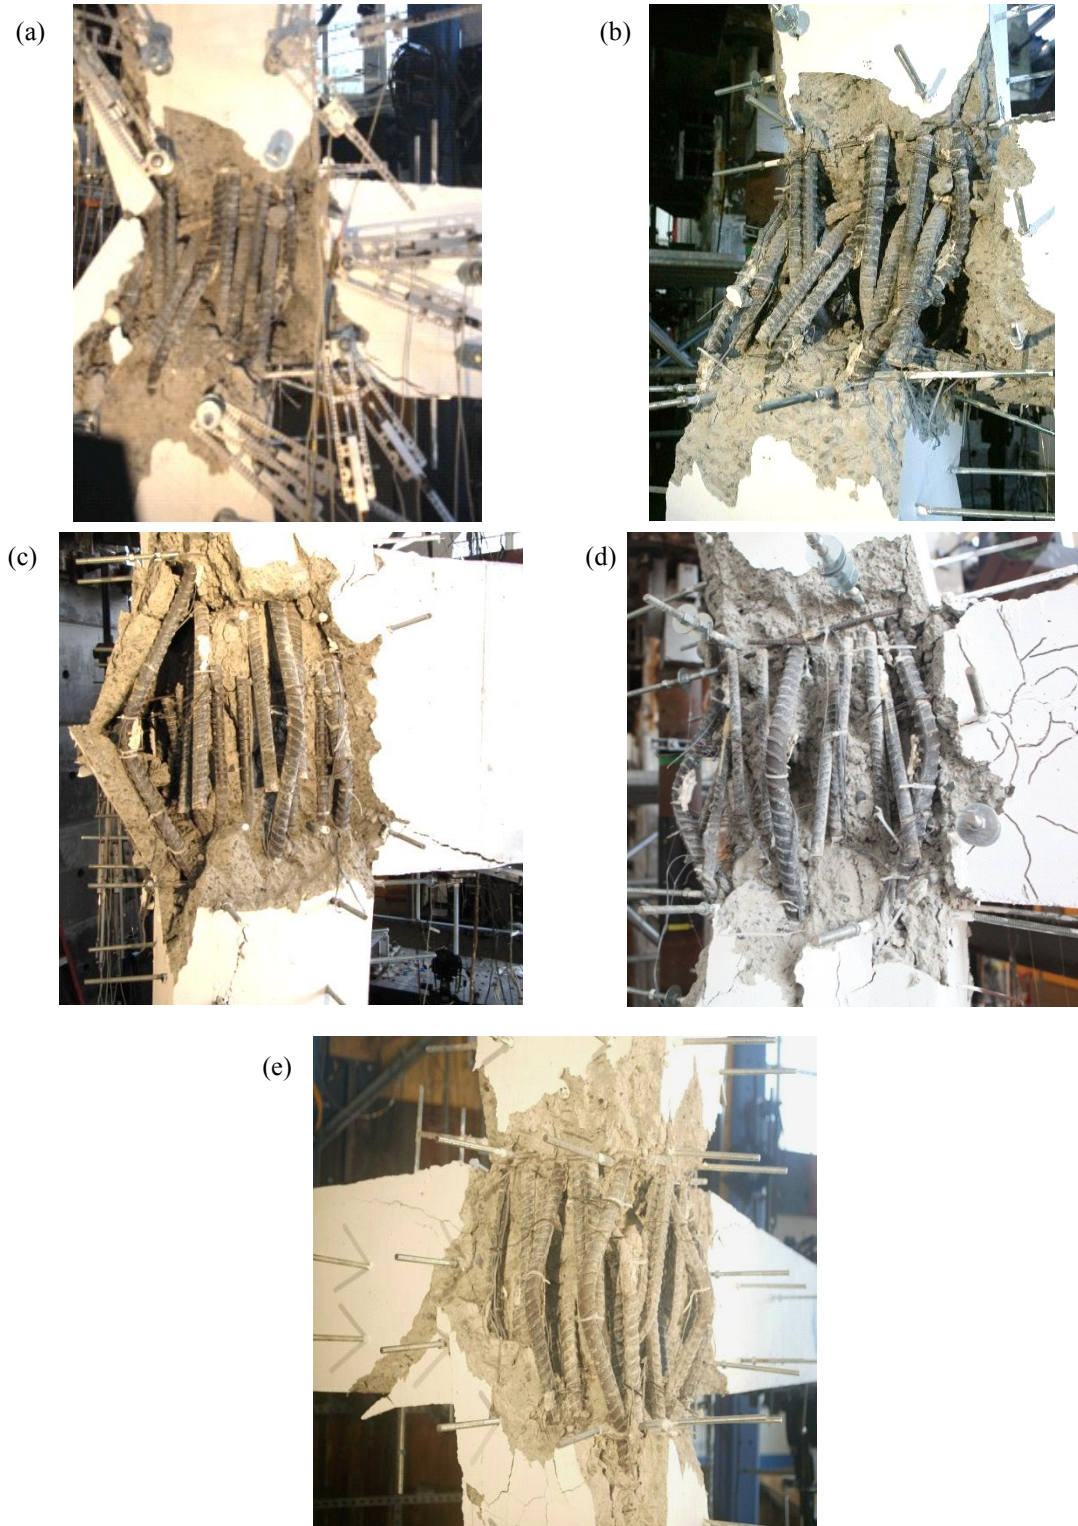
c shows the failure mode of specimen U-J-2 whose axial load ratio at peak joint shear strength was 0.44 while that at axial failure was 0.41. The drift capacity at axial failure was 3.06%, with a maximum drift ratio 3.42% before axial failure. A buckling failure mode of column reinforcing bars is obvious. A sliding failure on the diagonal shear failure surface was observed following removal of damaged concrete debris, although it was less apparent than that in specimen U-J-1. Similar axial failure modes to that of specimen U-J-2 were observed in specimens B-J-1 and U-BJ-1.
